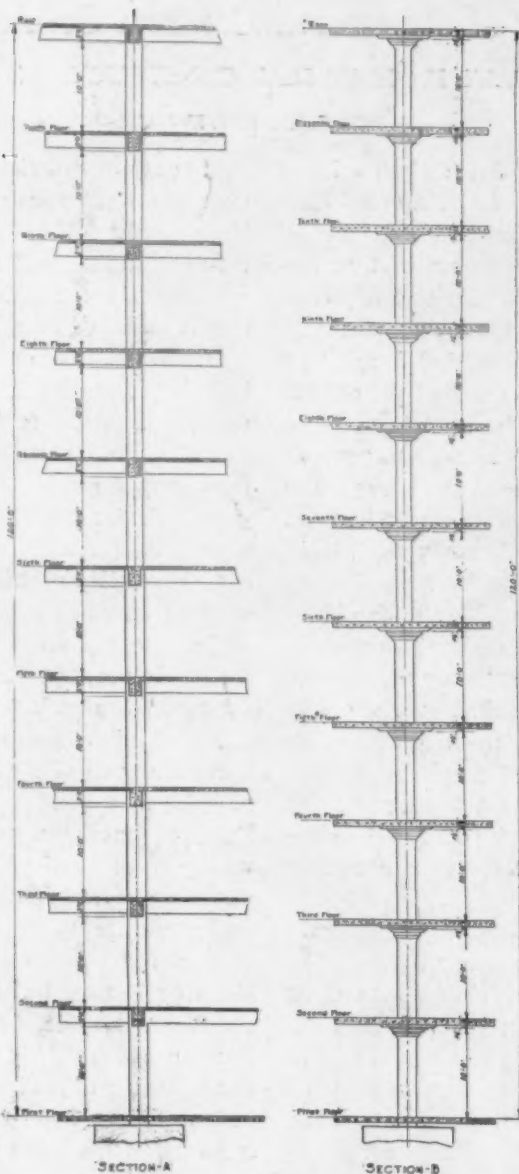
Comparison of Beam and Girder with Flat Slab Construction in Building 120 Feet High
